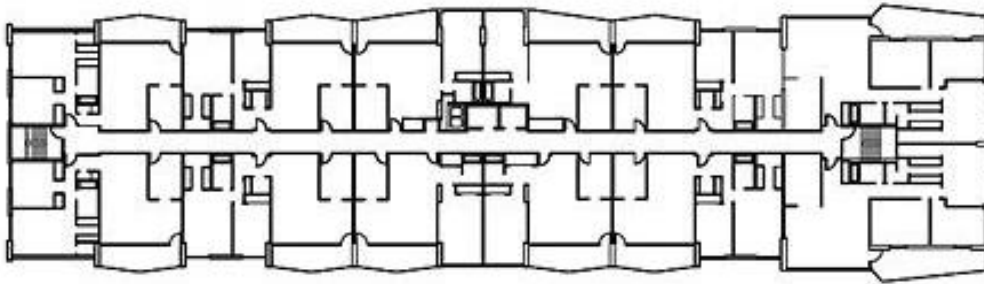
Typical Floor Plan (from 2nd to 20th Floor) (Kesik & Saleff, 2009)
